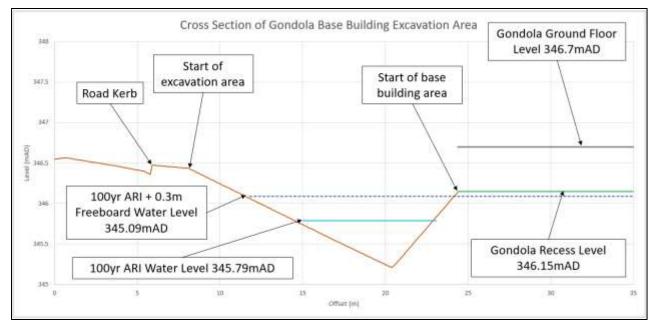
Cross Section of ondola Base Building E cavation Area
